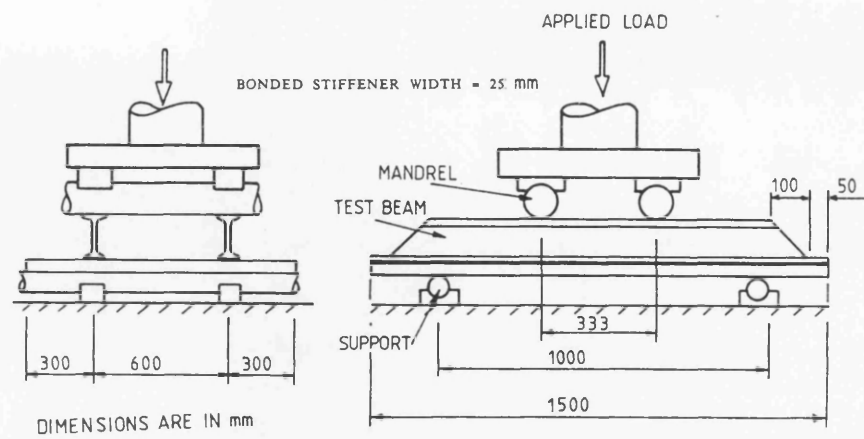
TEST ARRANGEMENT AND DETAILS OF PANEL TESTING
